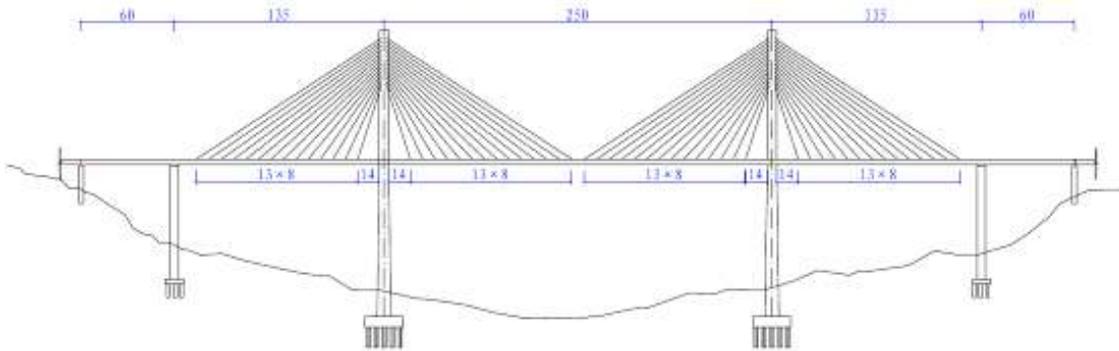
Cable-stayed bridge elevation layout (unit: m)
